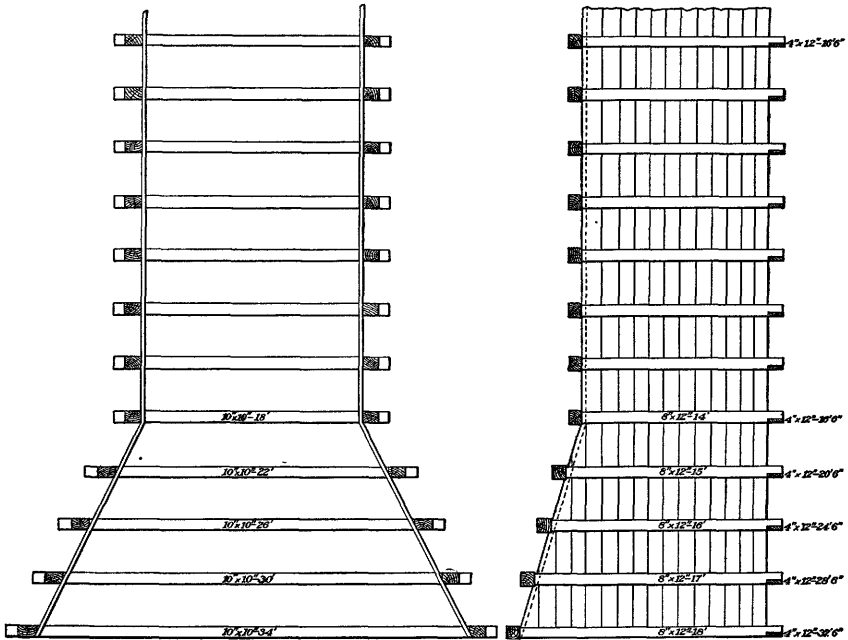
Plan and elevation of end of flume with inclined aprons.
